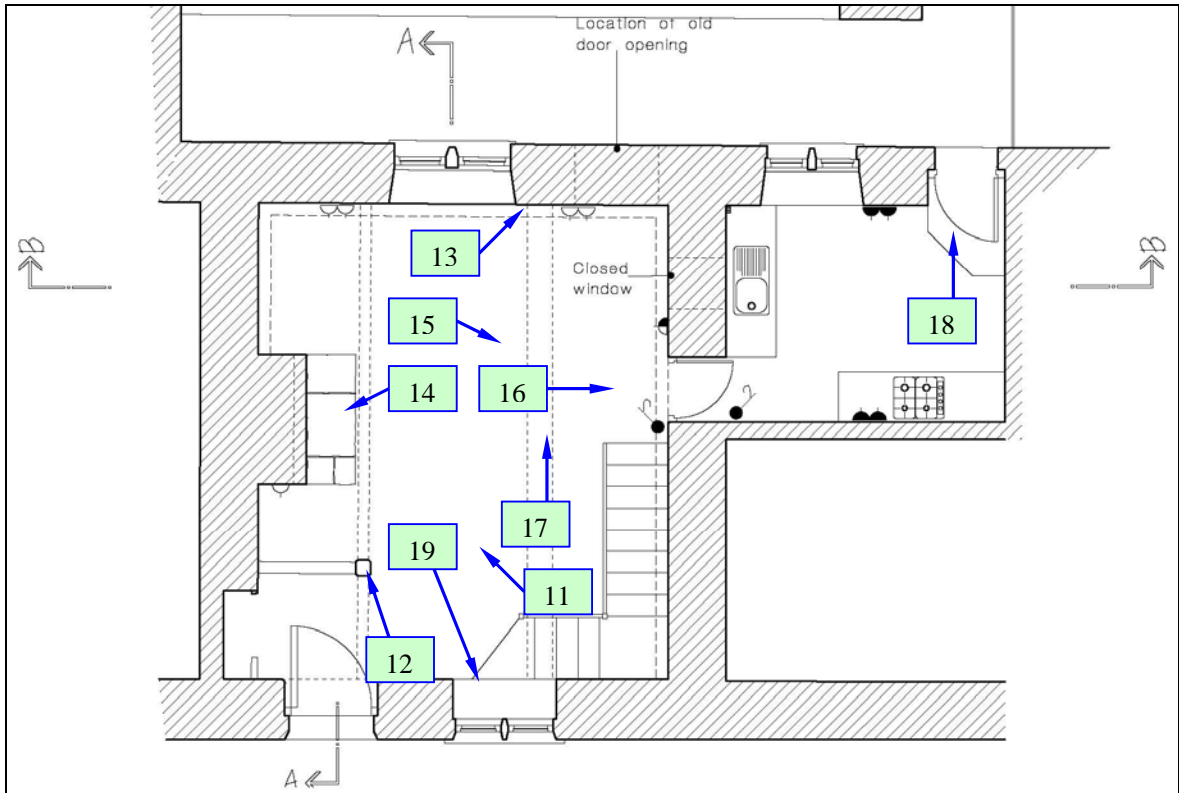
Ground floor layout showing image viewpoints (Anthony Flanagan)
